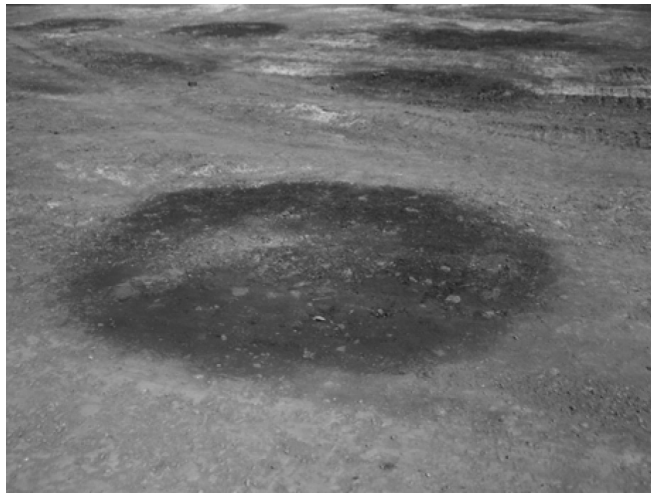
Area reinforced with the DR method, visible damp spots in places where columns are located
